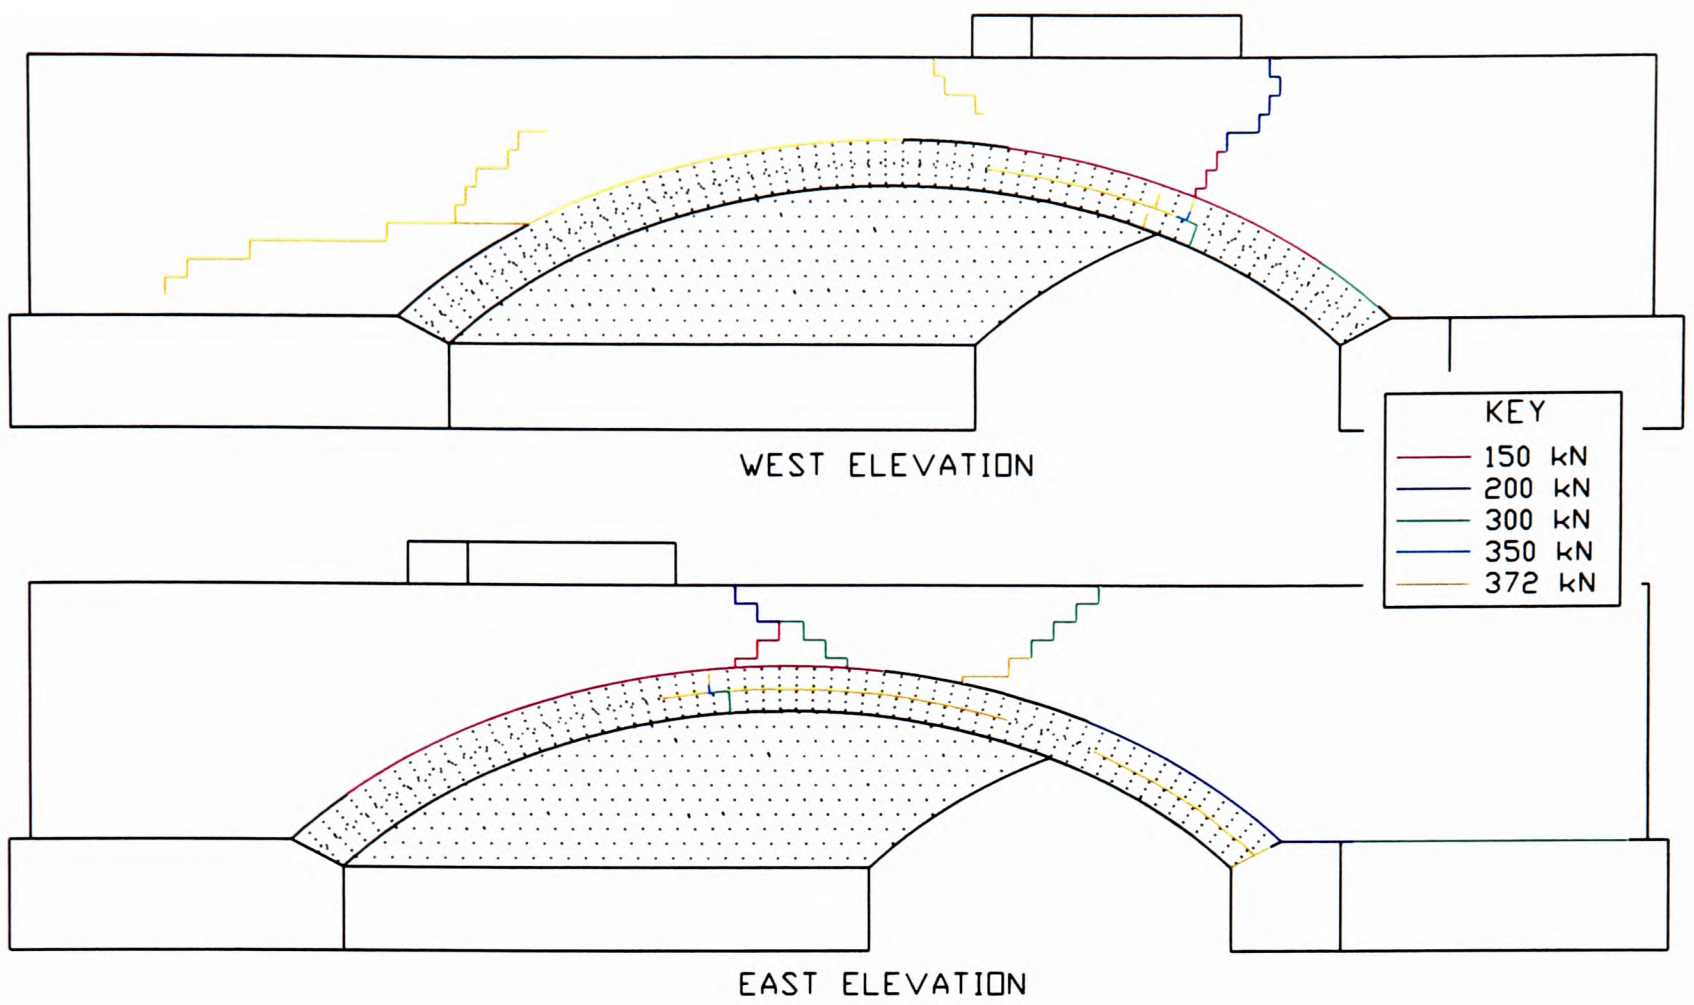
Development of cracks up to failure within skewed arch 3-3
